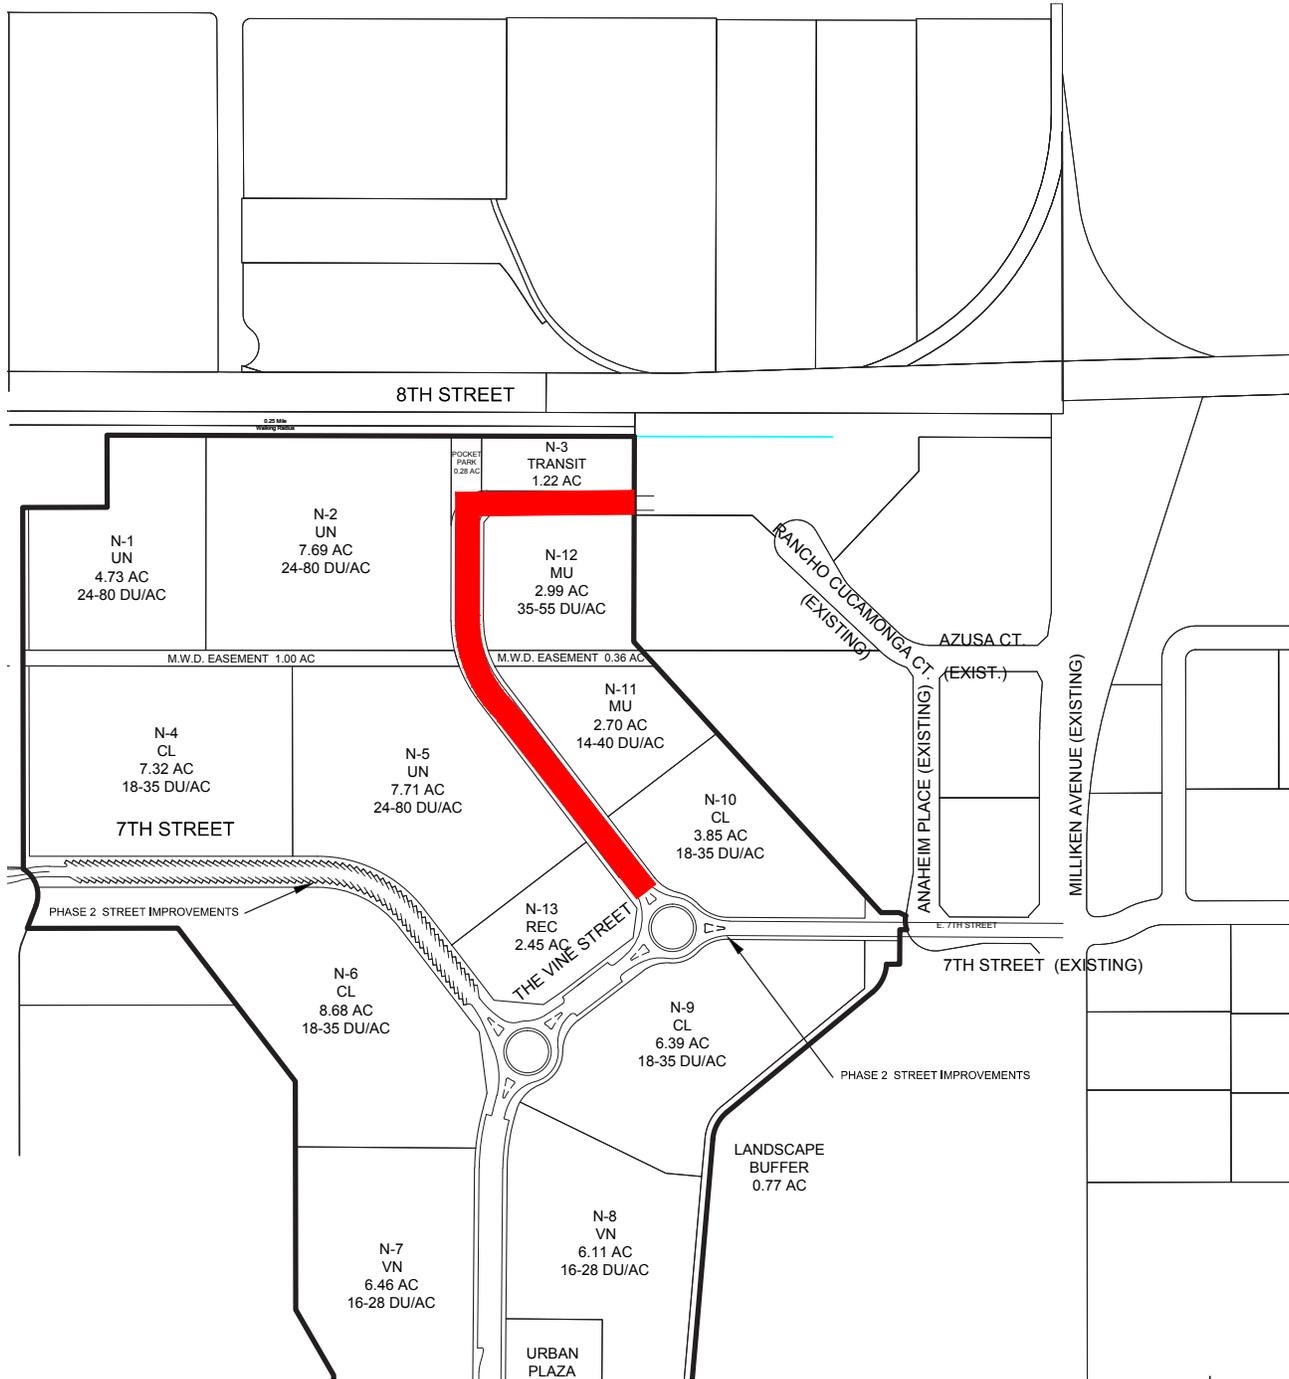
Conceptual Phase 3 Street Improvement Facilities Plan
